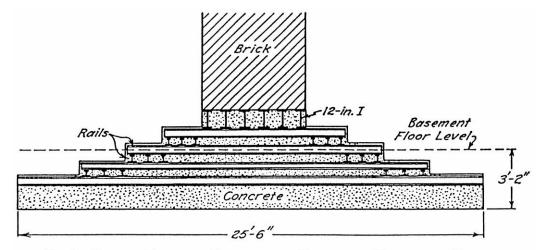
SECTION THROUGH RAIL-GRILLAGE FOOTING OF MONADNOCK BLOCK
